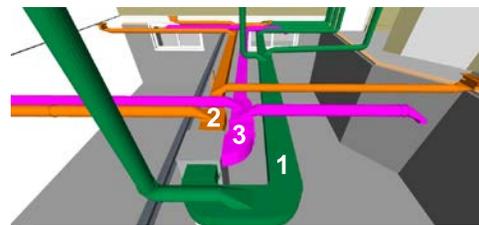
INSERT: Each Zone has a separate supply trunk connected to the equipment plenum (e.g. "1", "2", & "3" for second-floor, main-floor & basement zones).
